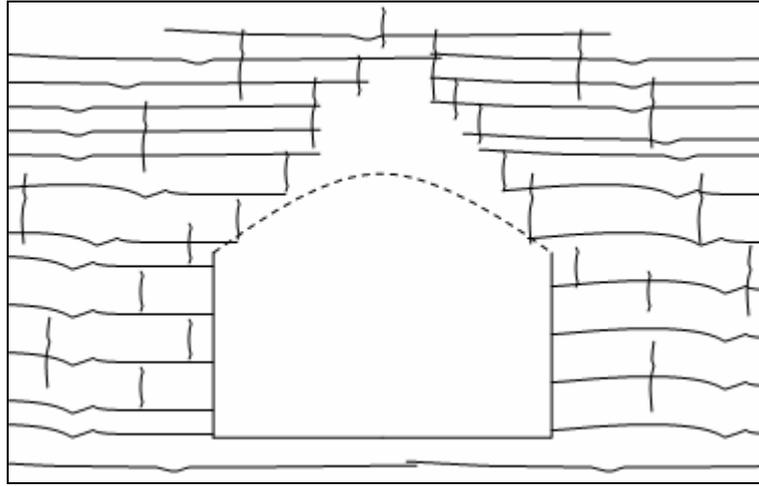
Cross-cutting joints and peaked roof formed by beam failure
